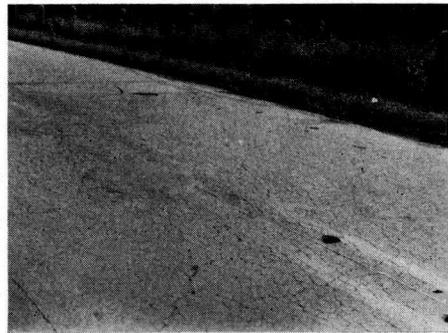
Advanced Map Cracking of "Sand-Gravel" Pavement
